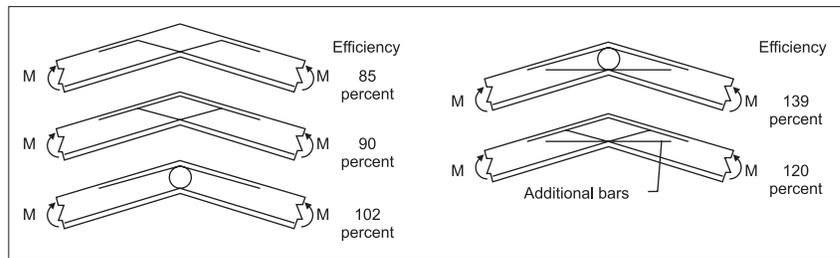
Reinforcement details tested by Wahab and Ali<sup>12</sup>
